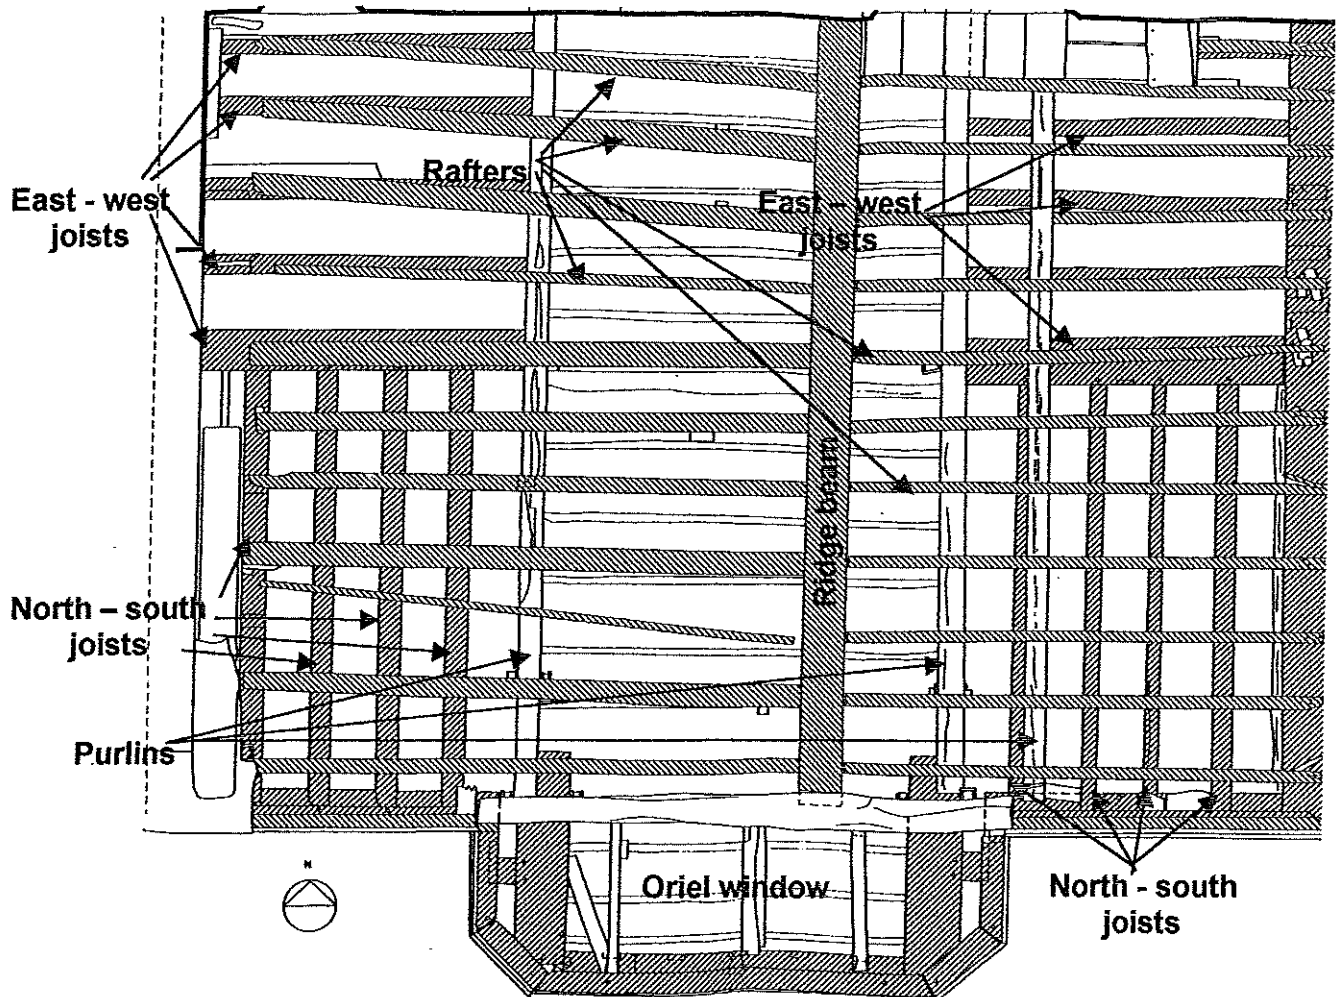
Plan to show position of sampled timbers in the Accounts Office roof
